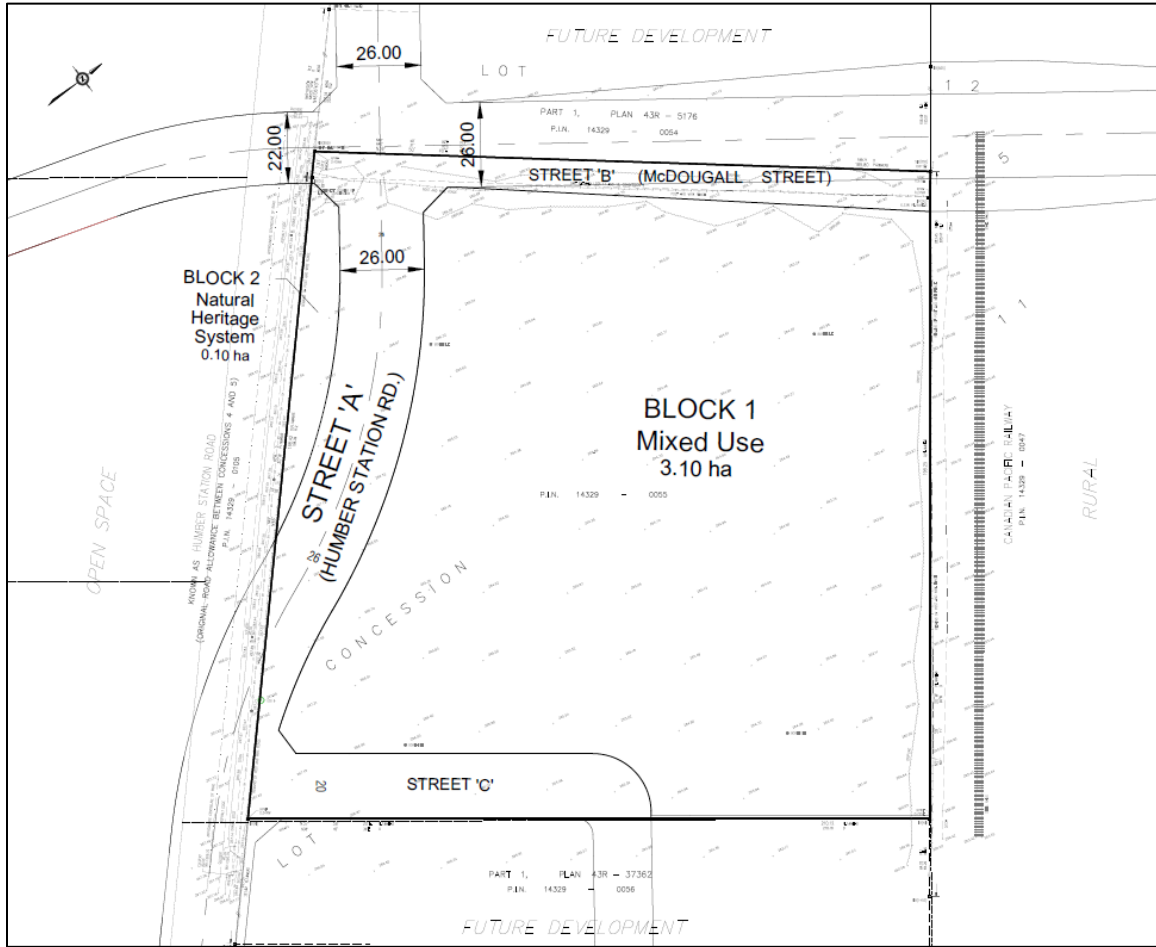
PROPOSED DRAFT PLAN OF SUBDIVISION (EAST)
